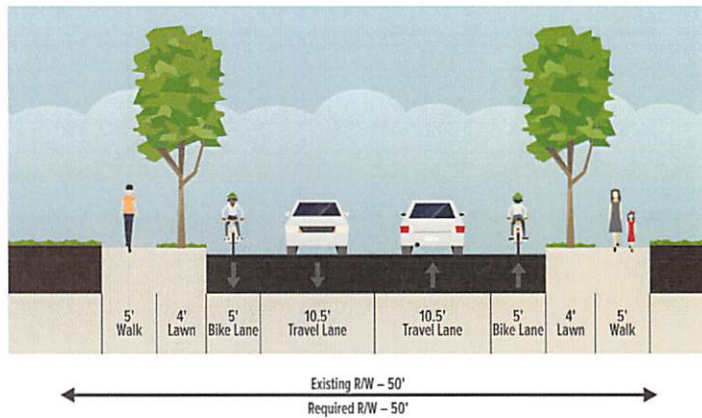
S.R. 55 TO W BROADWAY STREET – NO PARKING
